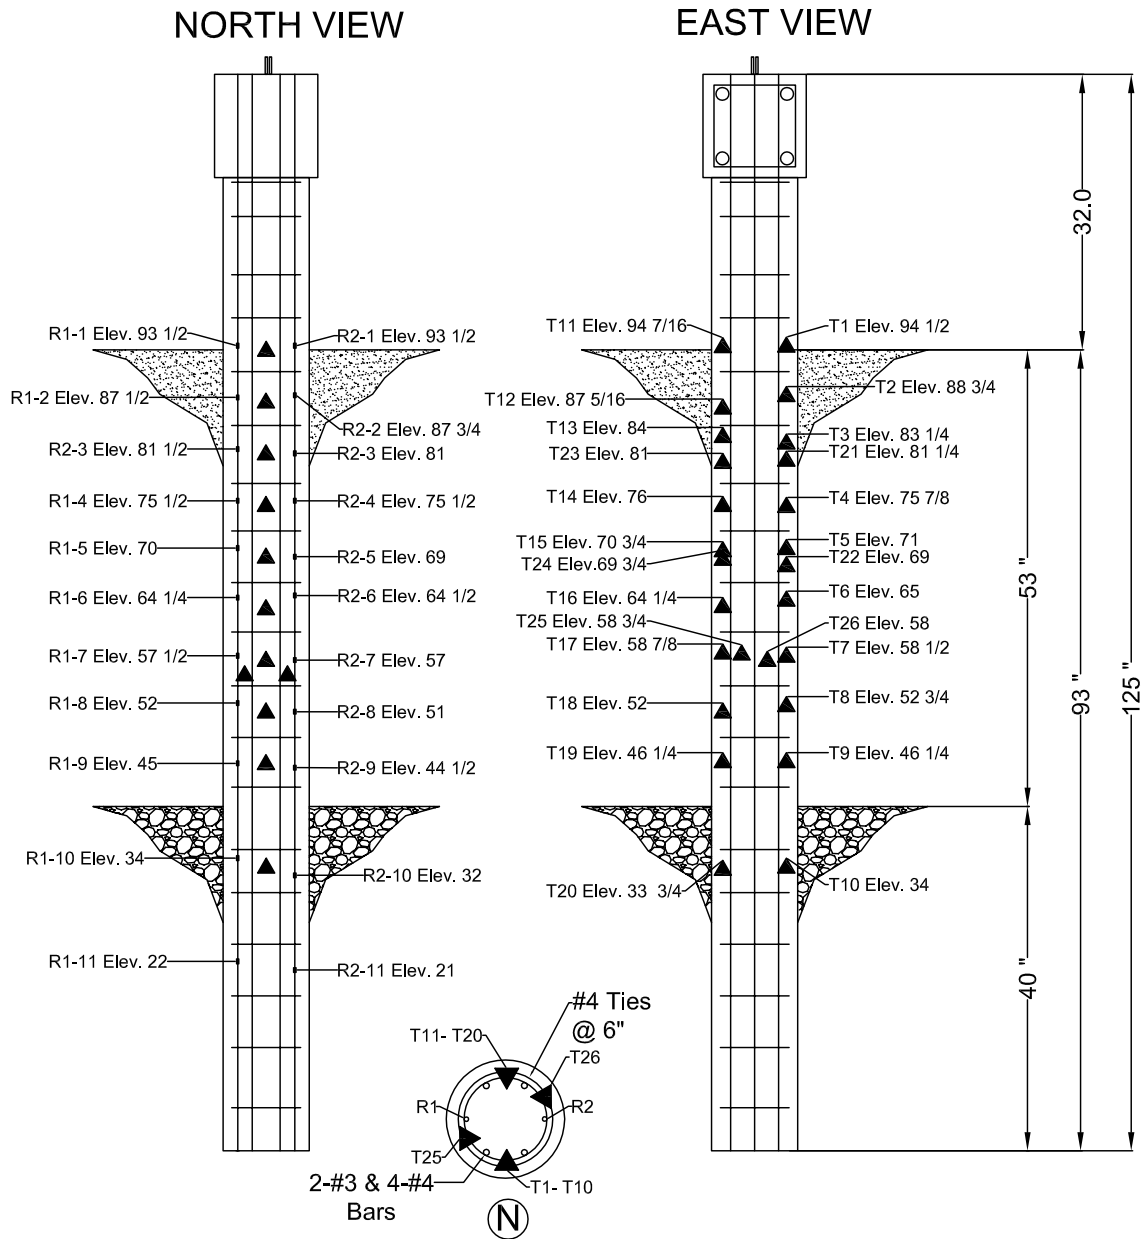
Pile 4. Schematic of the location of the strain gauges installed on two longitudinal rebars (North View), tetrahedra (East View), and pile cross section.
